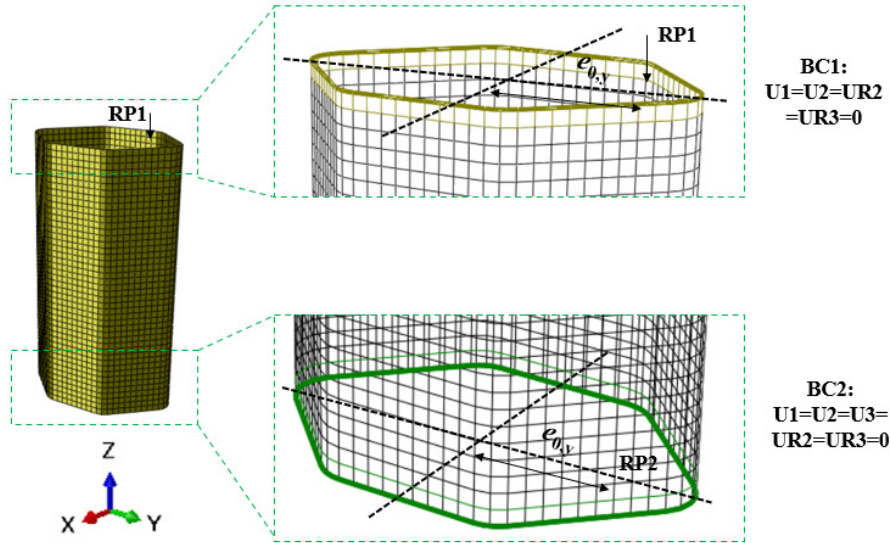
Typical loading and boundary conditions of the HSS IHexHS stub columns under combined compression and bending.
